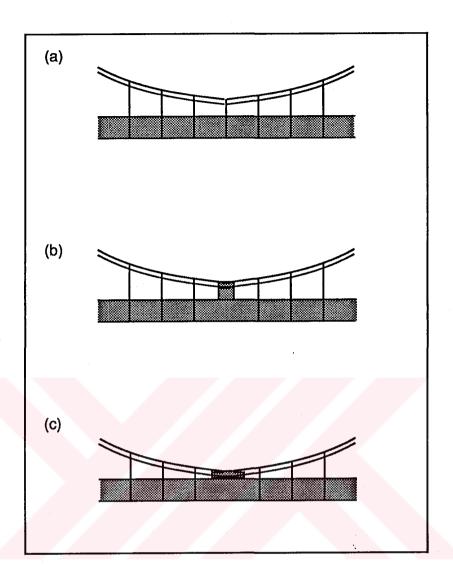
CONNECTION BETWEEN THE MAIN CABLE AND THE STIFFENING GIRDER AT MIDSPAN
